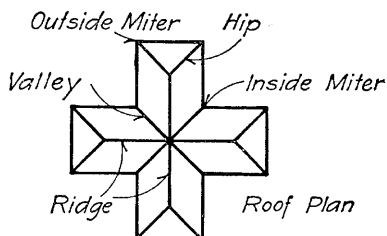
Plan of Hipped Roof, Showing Outside and Inside Miters.
